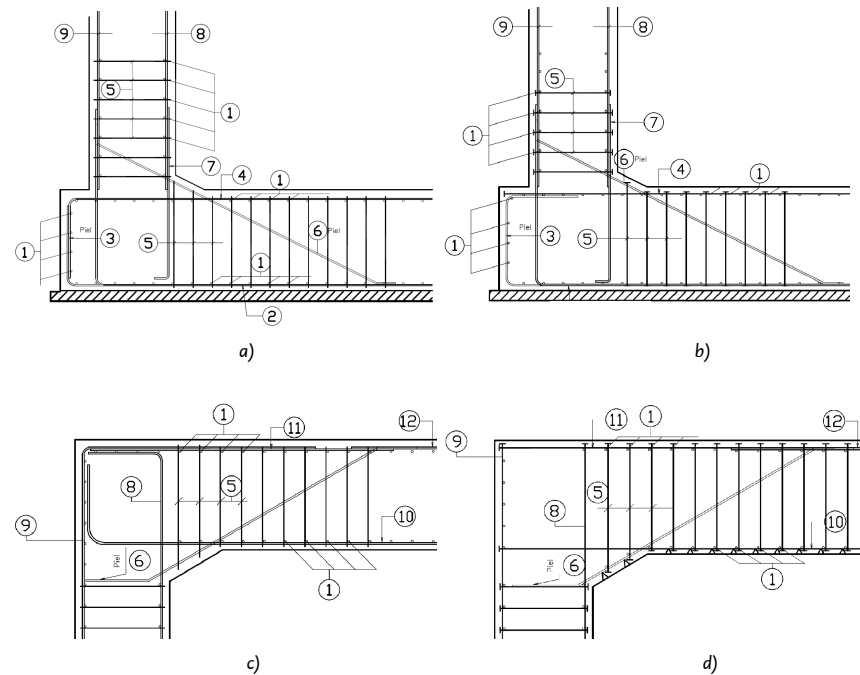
Reinforcement details for knee joints using either hooked bars or headed bars
